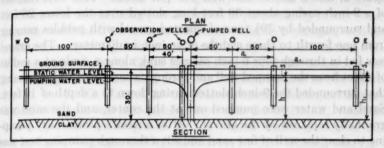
PLAN AND SECTION SHOWING THE ARRANGEMENT OF WELLS AND GROUND WATER CONDITIONS DURING A PUMPING TEST ON A SHALLOW GRAVEL-WALL WELL NEAR ELIZABETH CITY, NORTH CAROLINA
